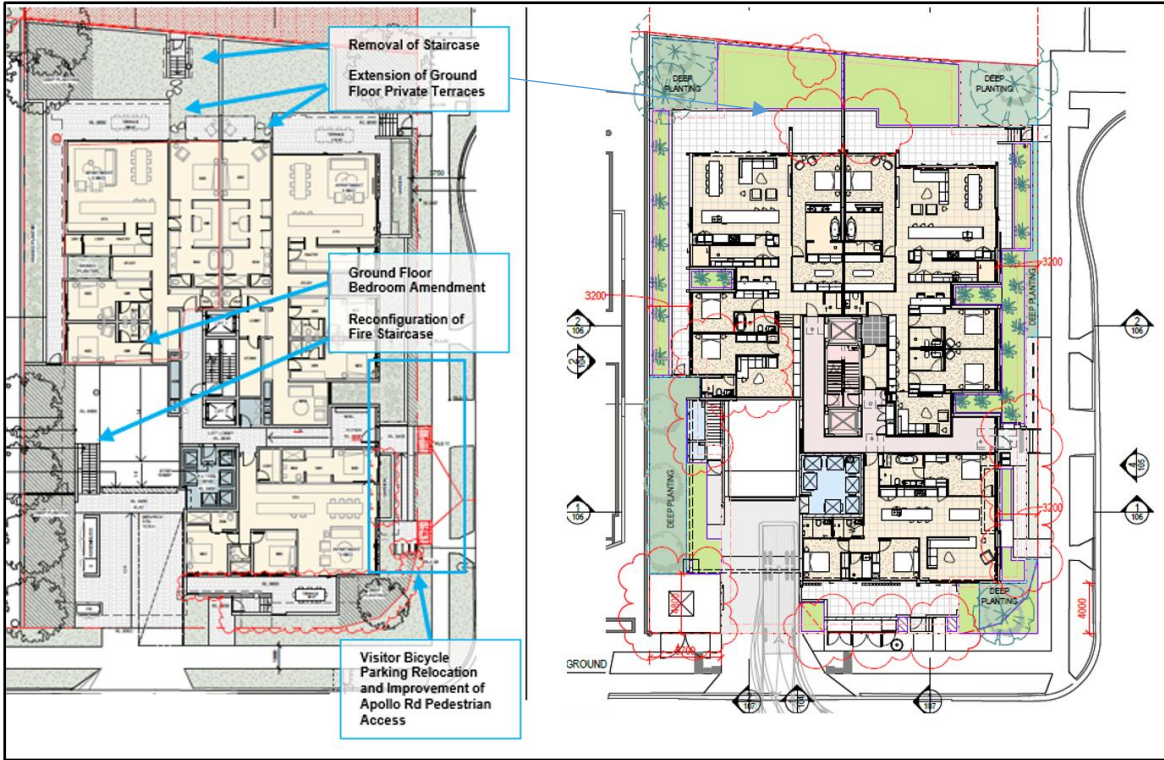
Approved Ground Floor Plan (Left) vs Proposed Ground Floor Plan (Right) (Source: MODE)
